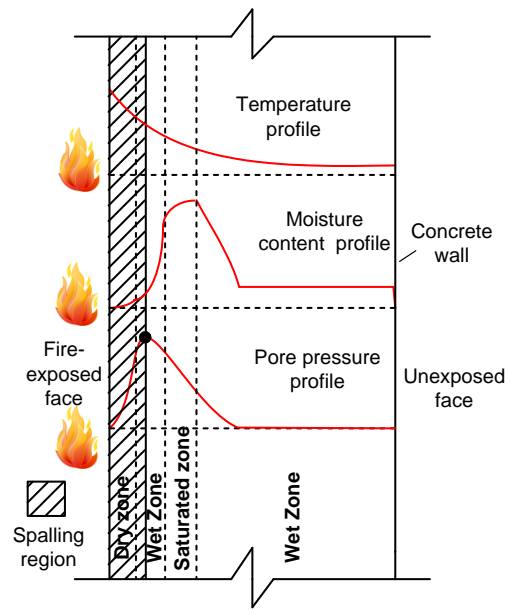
Schematic representation of thermo-hygral spalling of a concrete wall exposed to fire on one face
